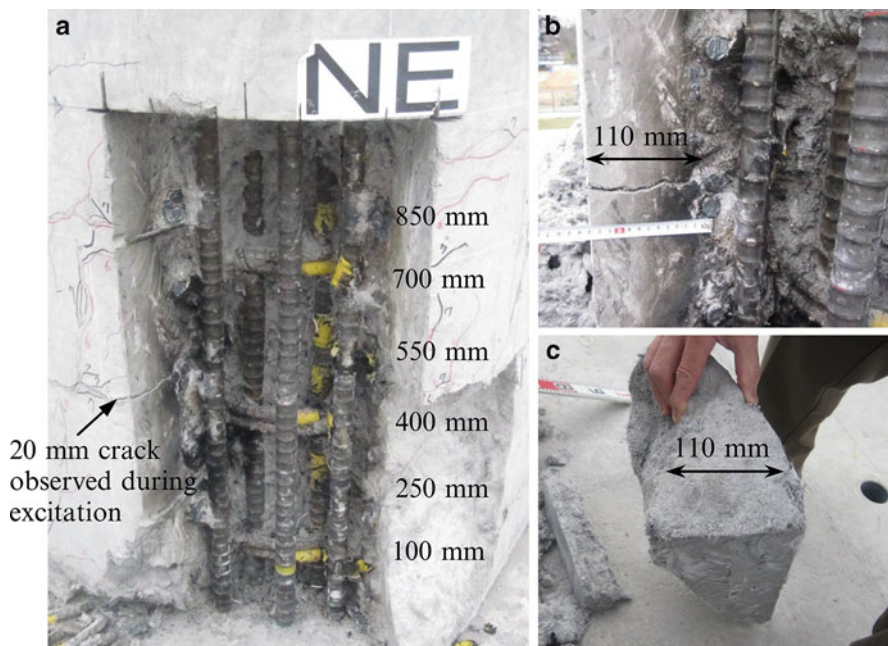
Longitudinal bar buckling and damage of PFRC cover concrete at the NE corner after 2–125 % (3) excitation (a) Opened area (b) Crack on cover concrete (c) Cover concrete block
